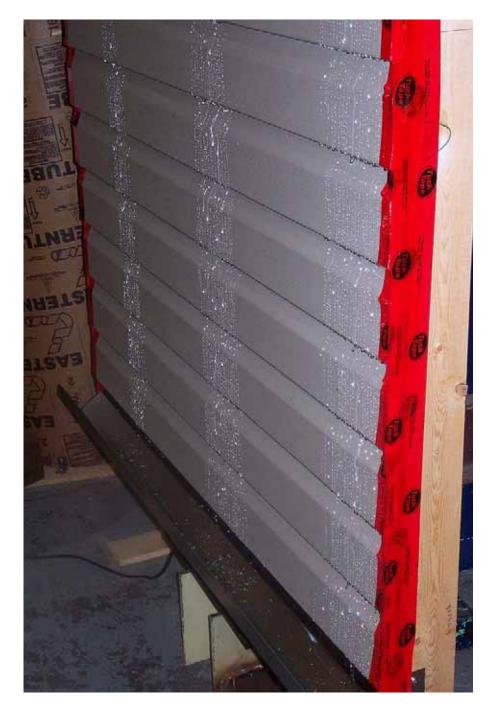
Wall 3 showing water cascading from drainage holes provided in the siding profile at the top course. Note the drainage is largely held along the siding surface by the design of the profile.
